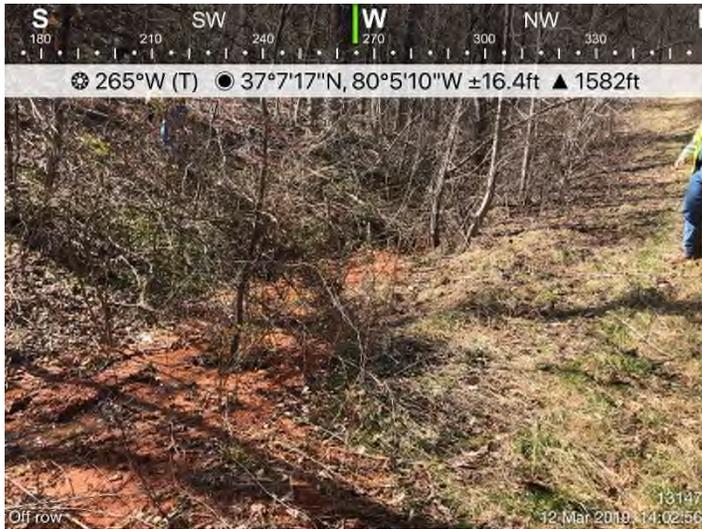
STA 13143+00 – ROW limit at bank failure at S-D17.
